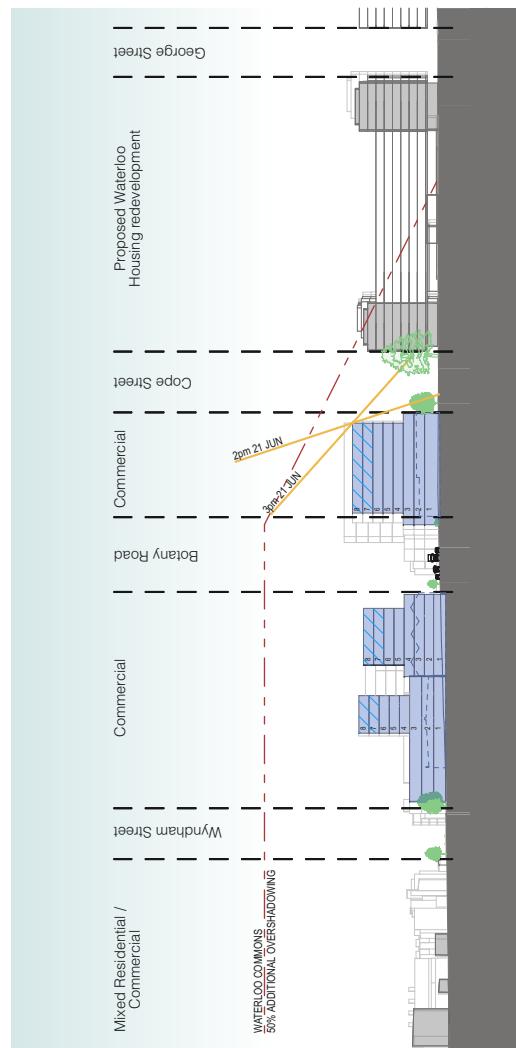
Section 2 - McEvoy Street Quarter, through Wyndham Street, Botany Road and Waterloo Housing redevelopment. Afternoon solar access.
